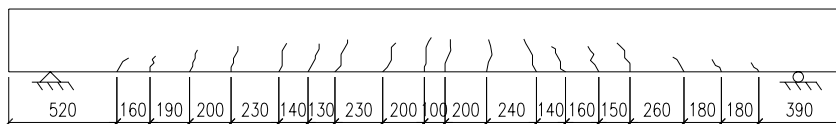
Longitudinal view of intact beam with crack pattern after failure load test.
